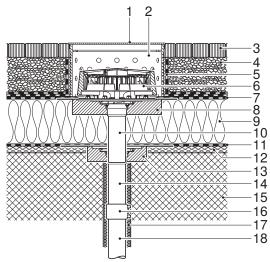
Installation in a solid roof insulated with vapour barrier and roof foil, suitable for promenade decks
